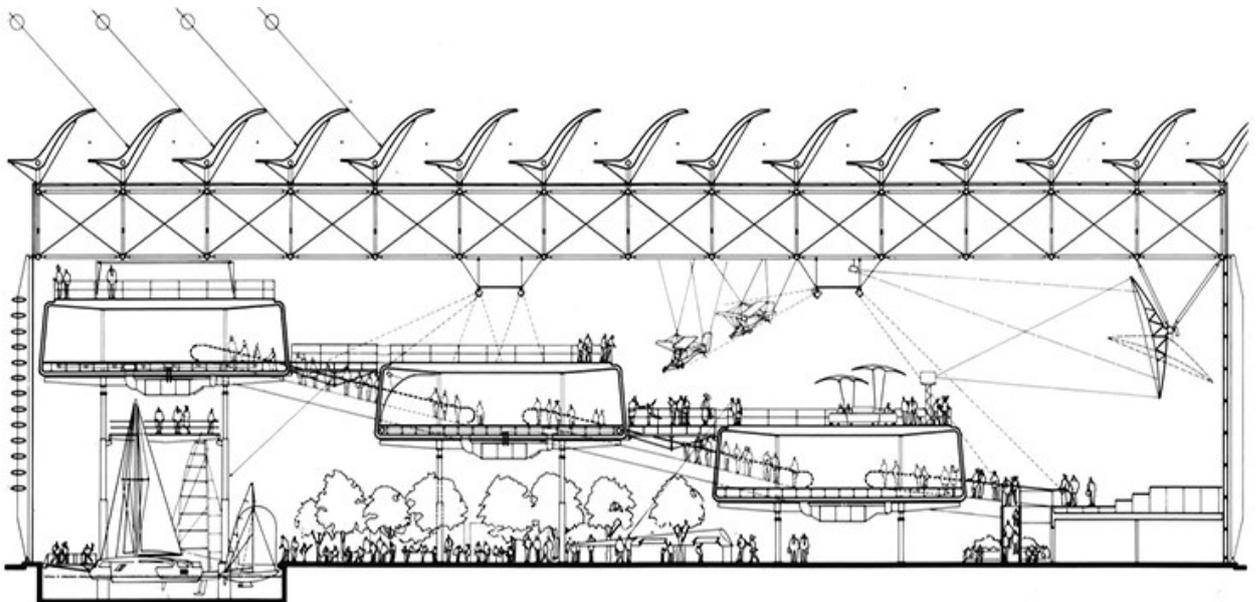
British Pavilion Expo 1992 Seville, Spain. Architect N. Grimshaw. The longitudinal section, the “water wall” on the southern façade [13]
